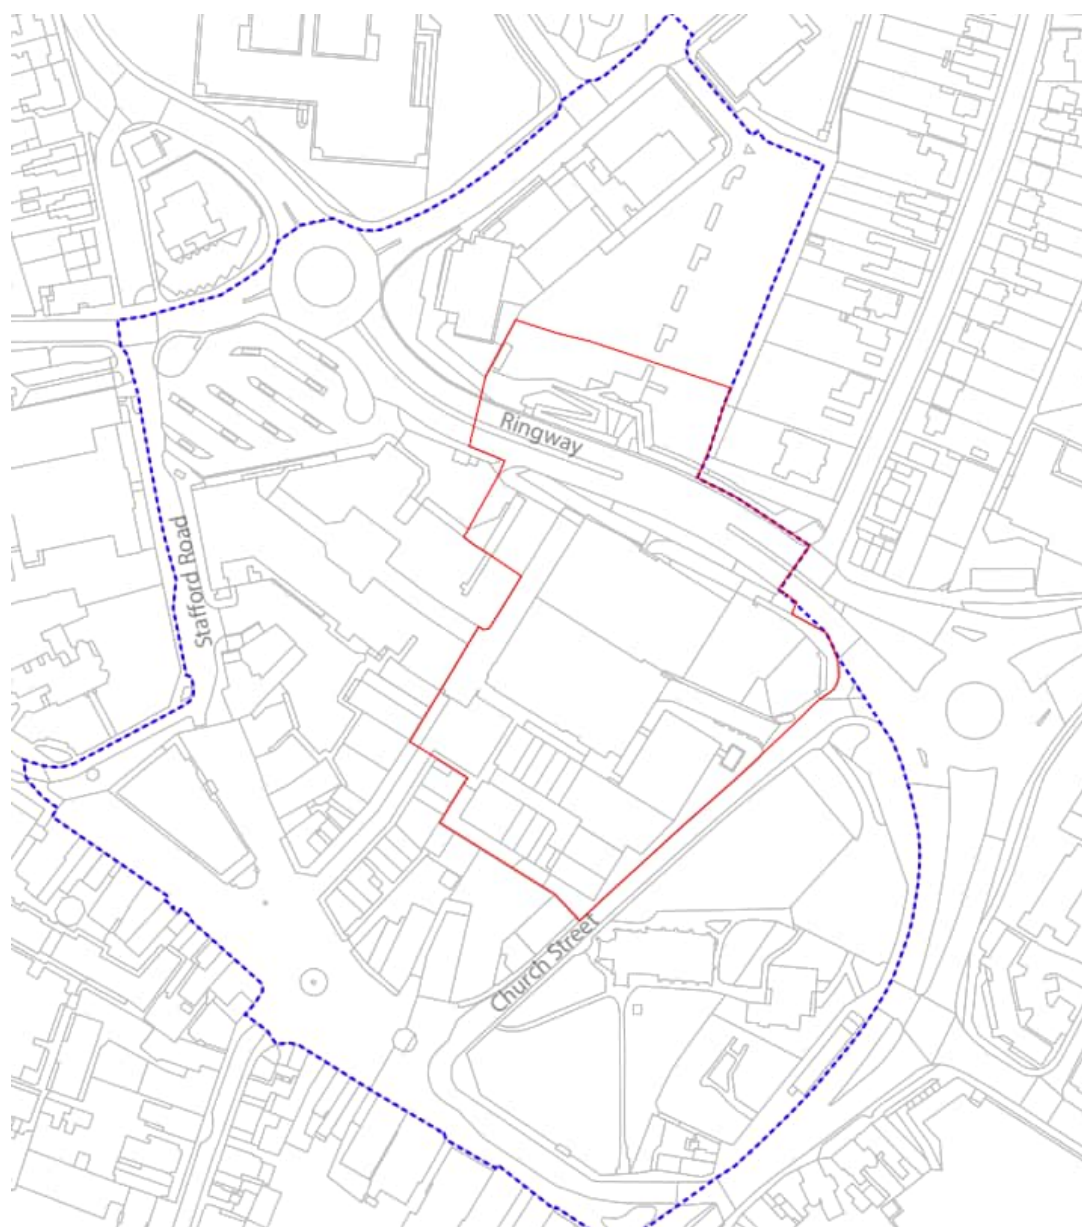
Extract from submitted Location Plan showing the extent of the site area in red, and the extent of the Levelling Up Fund Area in blue.
